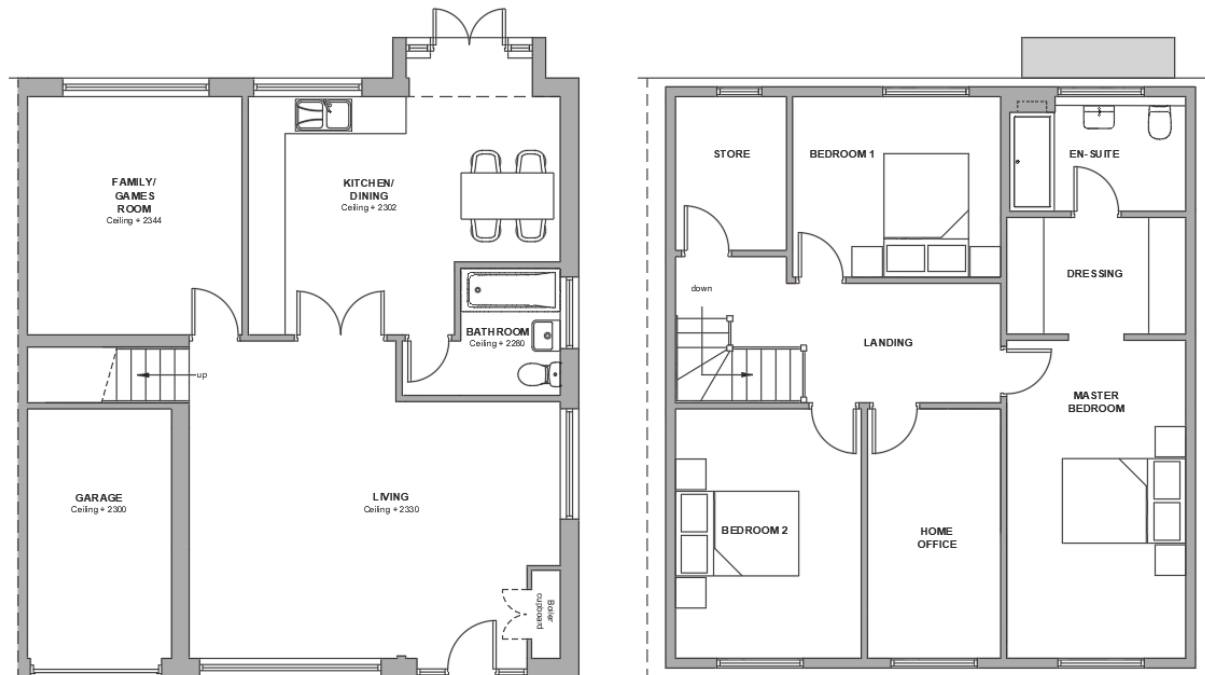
PROPOSED GROUND AND LOFT FLOOR PLANS
